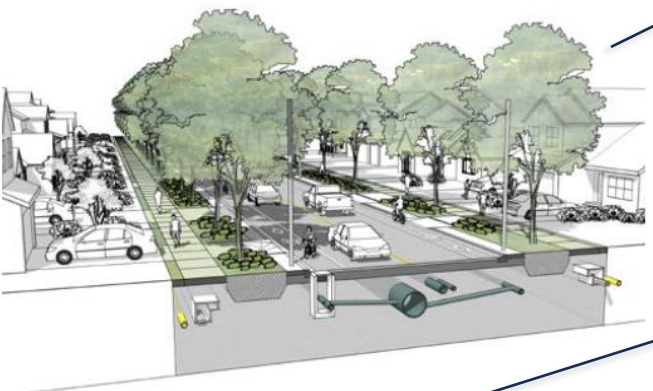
Demonstration of a Neighbourhood Residential Street
